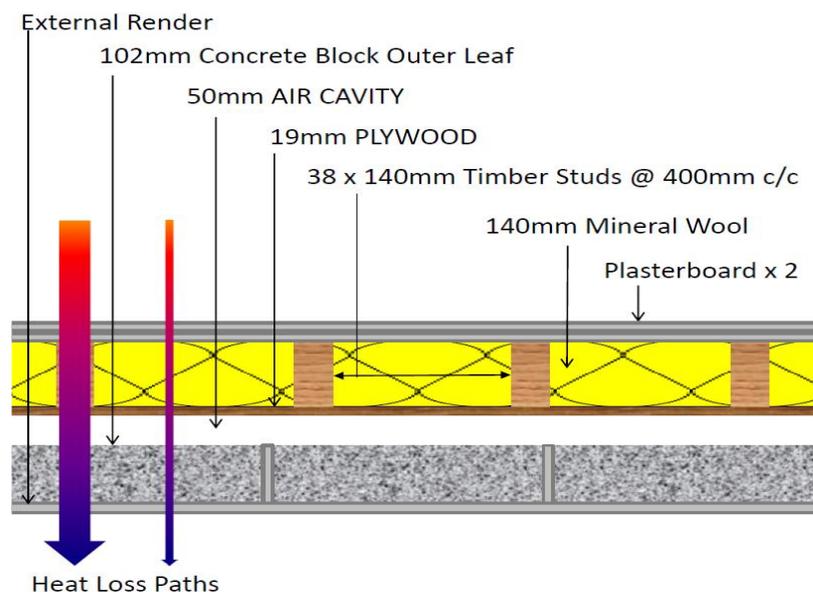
Typical timber frame external wall construction showing Thermal Bridging
